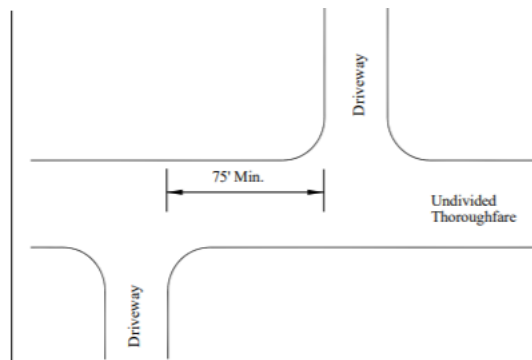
Driveway Spacing on Opposite Sides of an Undivided Street
